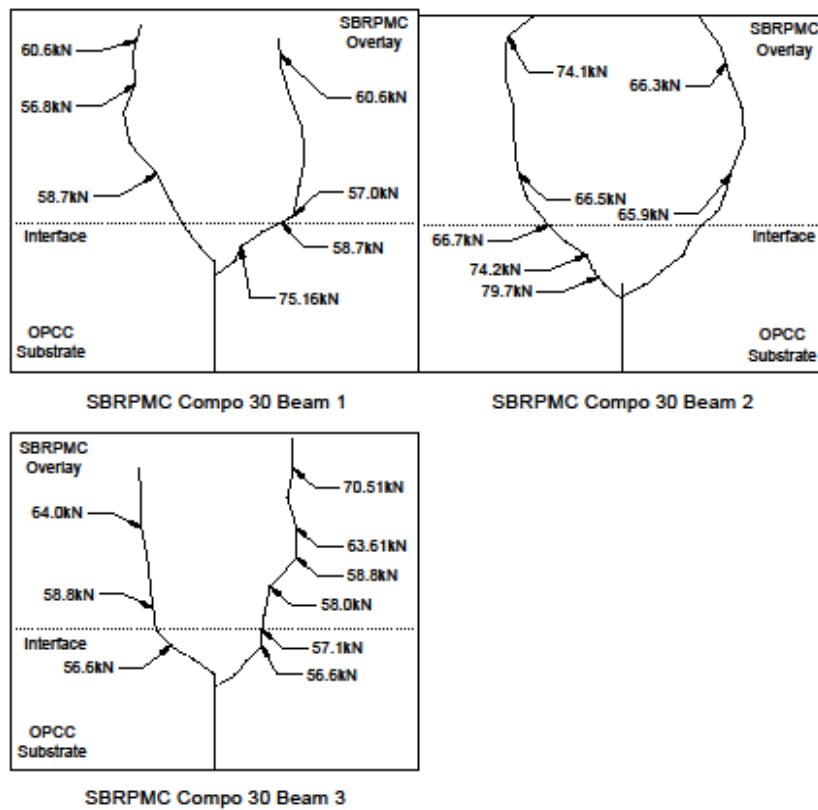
SBRPMC Compo 30 Beam Crack Trajectory and Load
